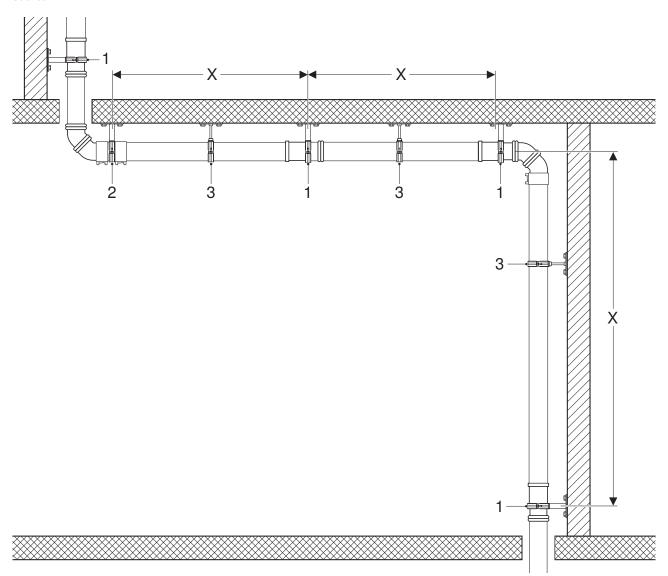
Design of the sliding installation with Geberit HDPE expansion sockets
